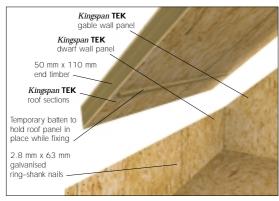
TIMBER BATTENS ON INTERNAL FACE OF ROOF SECTION
